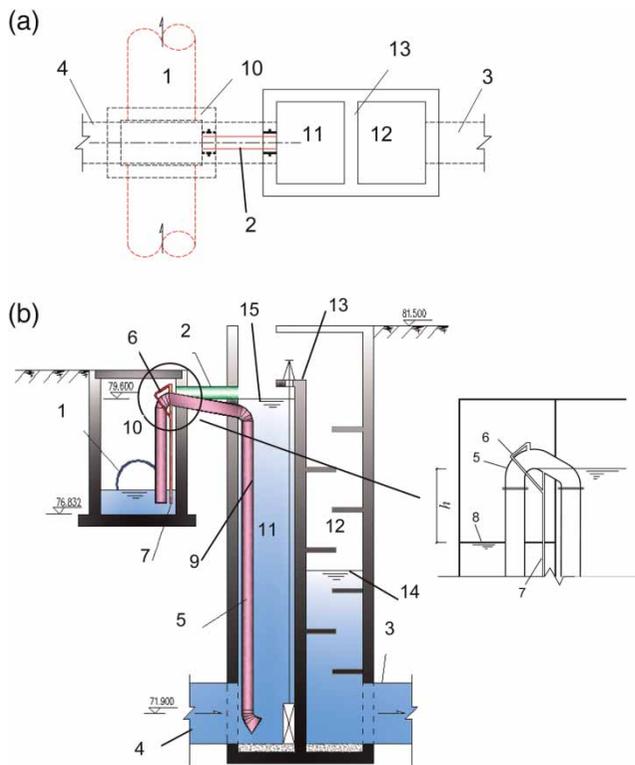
| The plan and profile of the deep CSO chamber in the intercepting sewer system in Liuzhou. (a) Plan view and (b) cross-sectional view with installation of SSCS. 1, Main intercepting sewer; 2, the branch intercepting sewer; 3, the combined sewer outlet; 4, combined sewer channel; 5, self-siphon pipe; 6, air evacuation pipe of self-siphon set; 7, auxiliary siphon pipe; 8, siphon head; 9, siphon-breaking hole; 10, intercepting chamber; 11, overflow chamber; 12, discharge chamber; 13, weir; 14, water level of receiving water; 15, intercepting water level.
